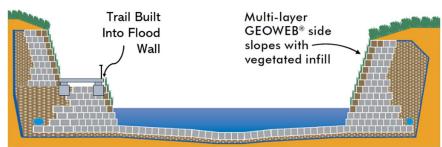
Manufactured Bank Stability Technique with Trail Overlay (Conceptual)
